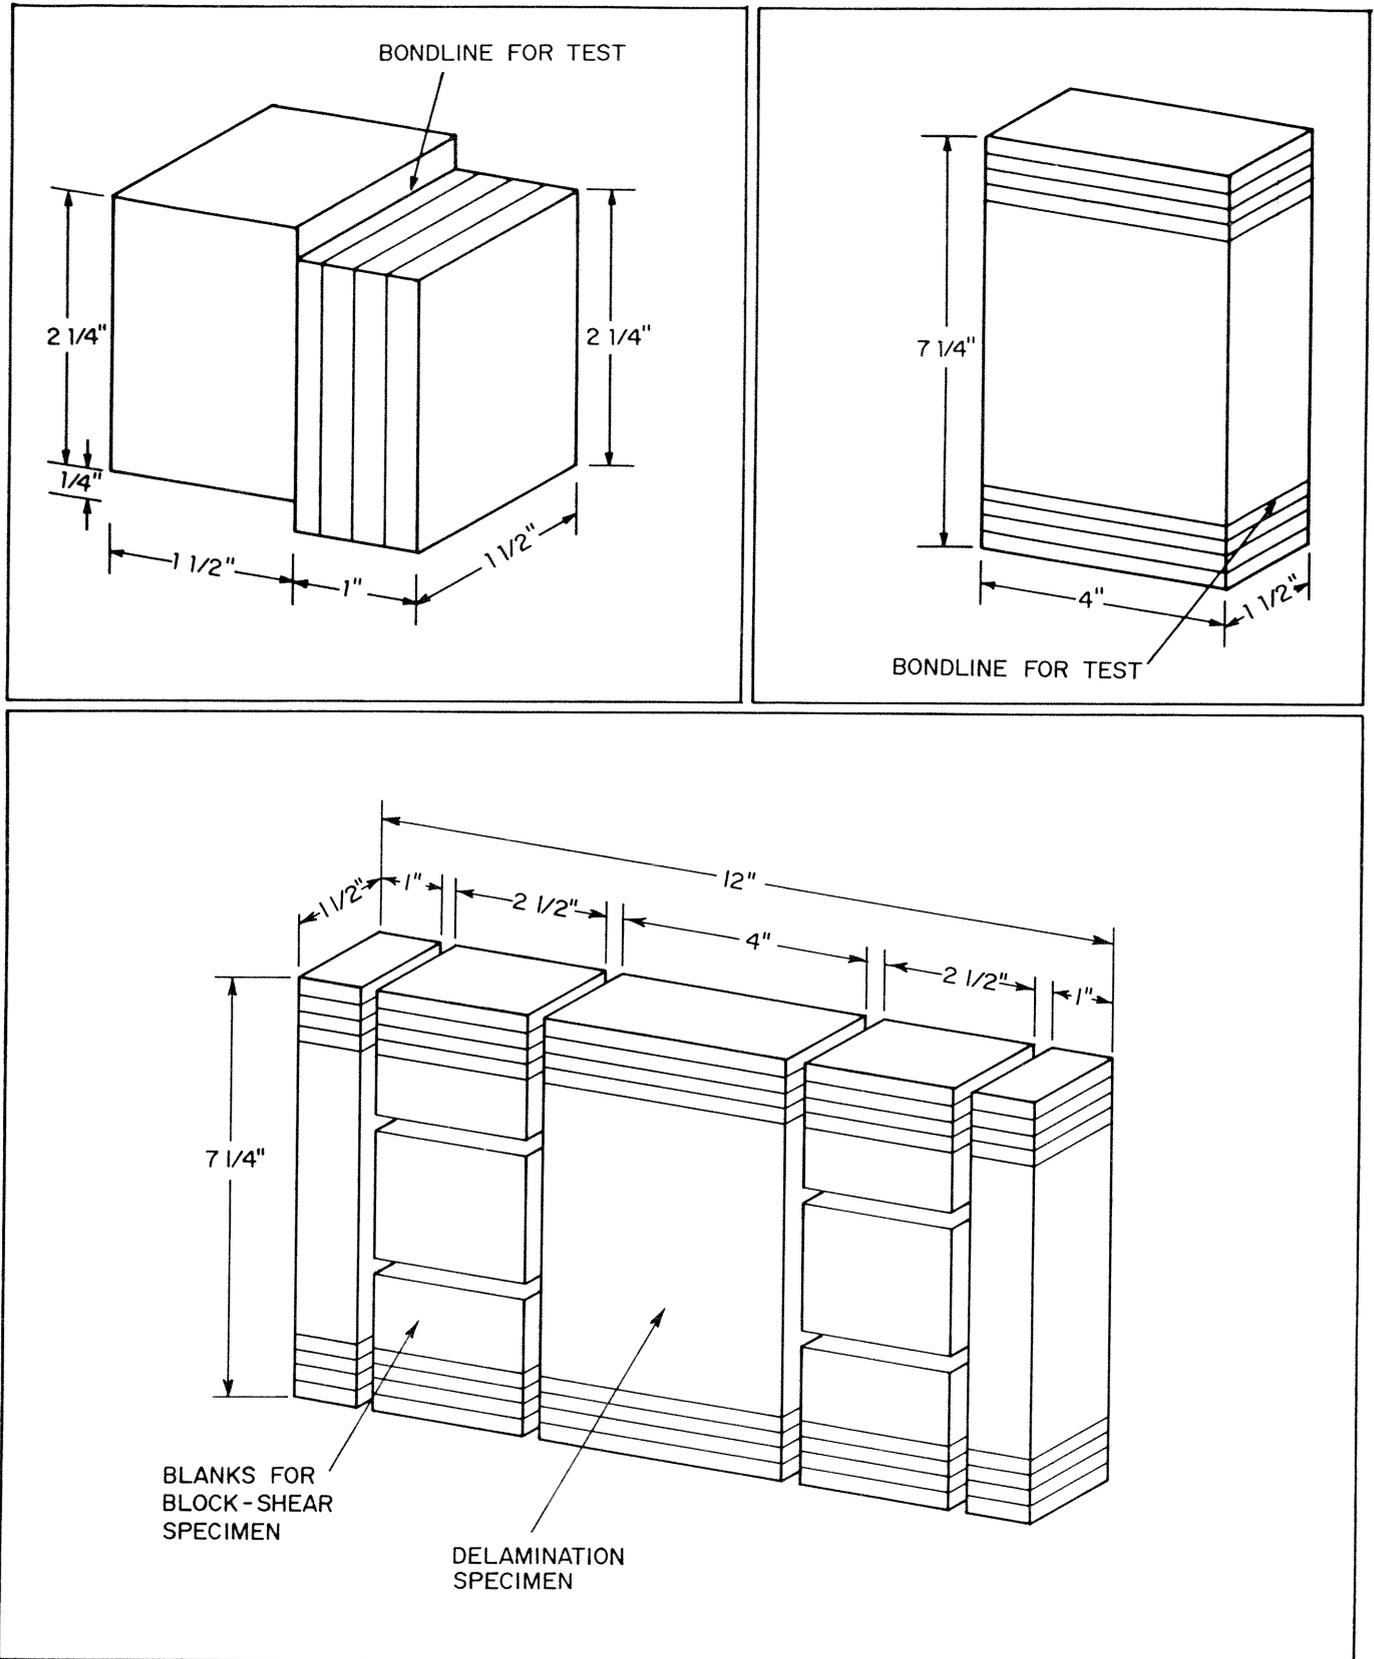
Configuration and dimensions of block-shear specimen (upper left), cross section for delamination test (upper right), and locations for cutting specimens from a composite assembly (lower).
